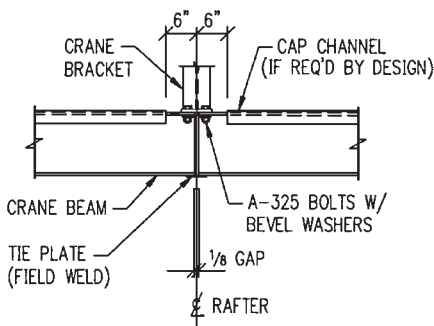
Runway beam splice at hanger locations. (*Metallic Building Systems.*)
